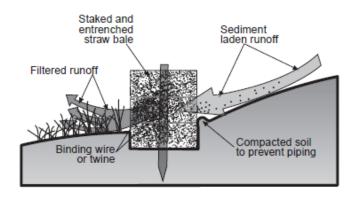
Cross-sectional view of an installed straw bale (Broz et al., 2003)
